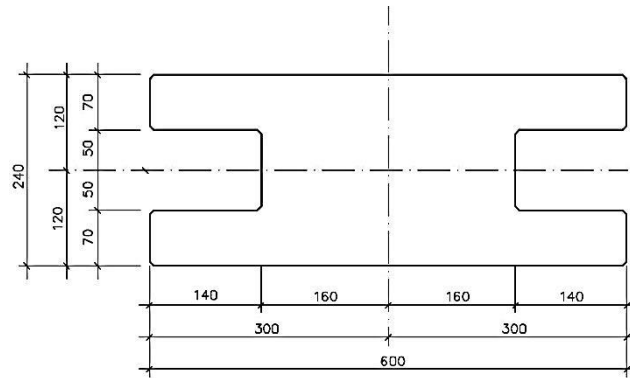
Cross Section of the Piers of Demirtaş Viaduct (in cm)
